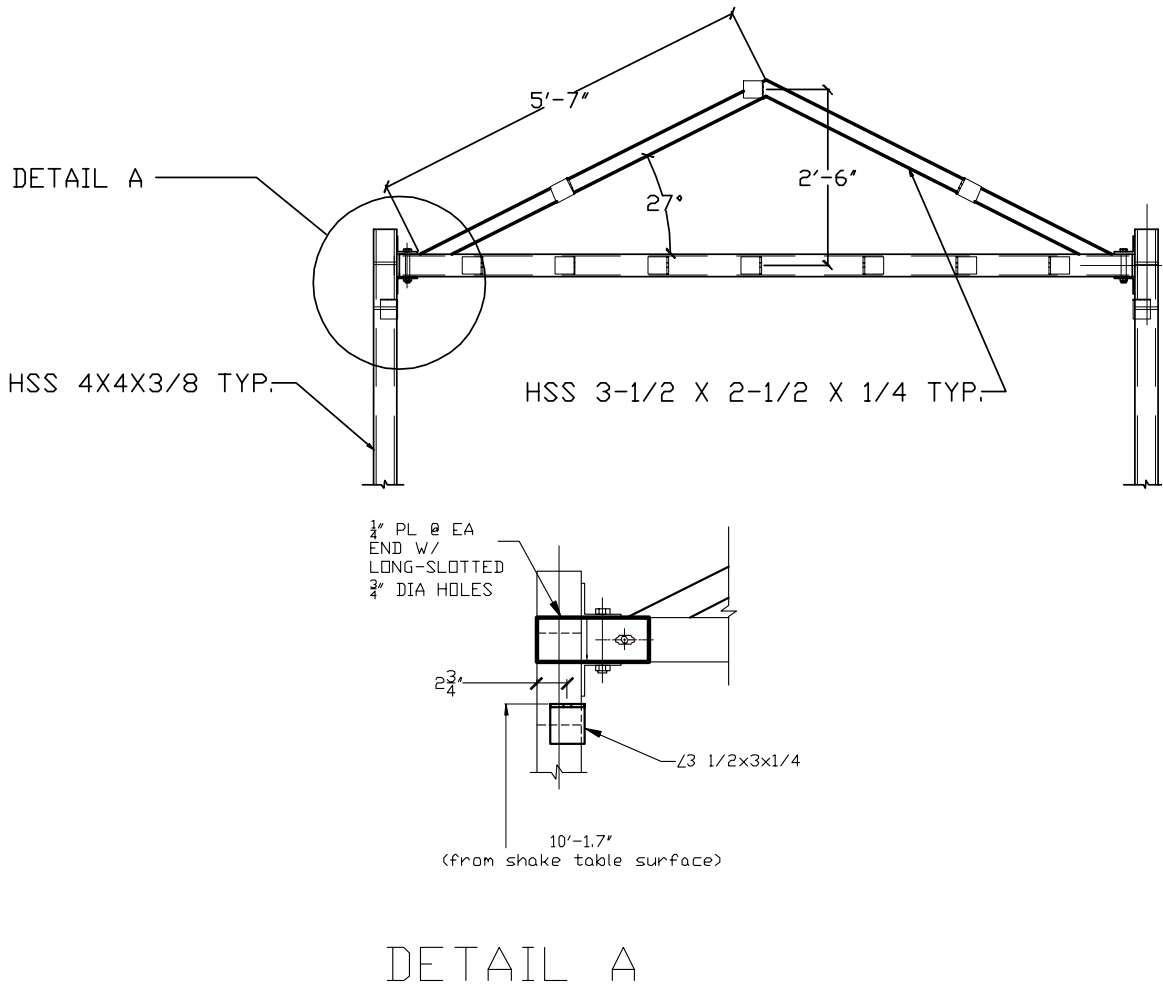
Additional details of steel reaction frame for Wall-3.
